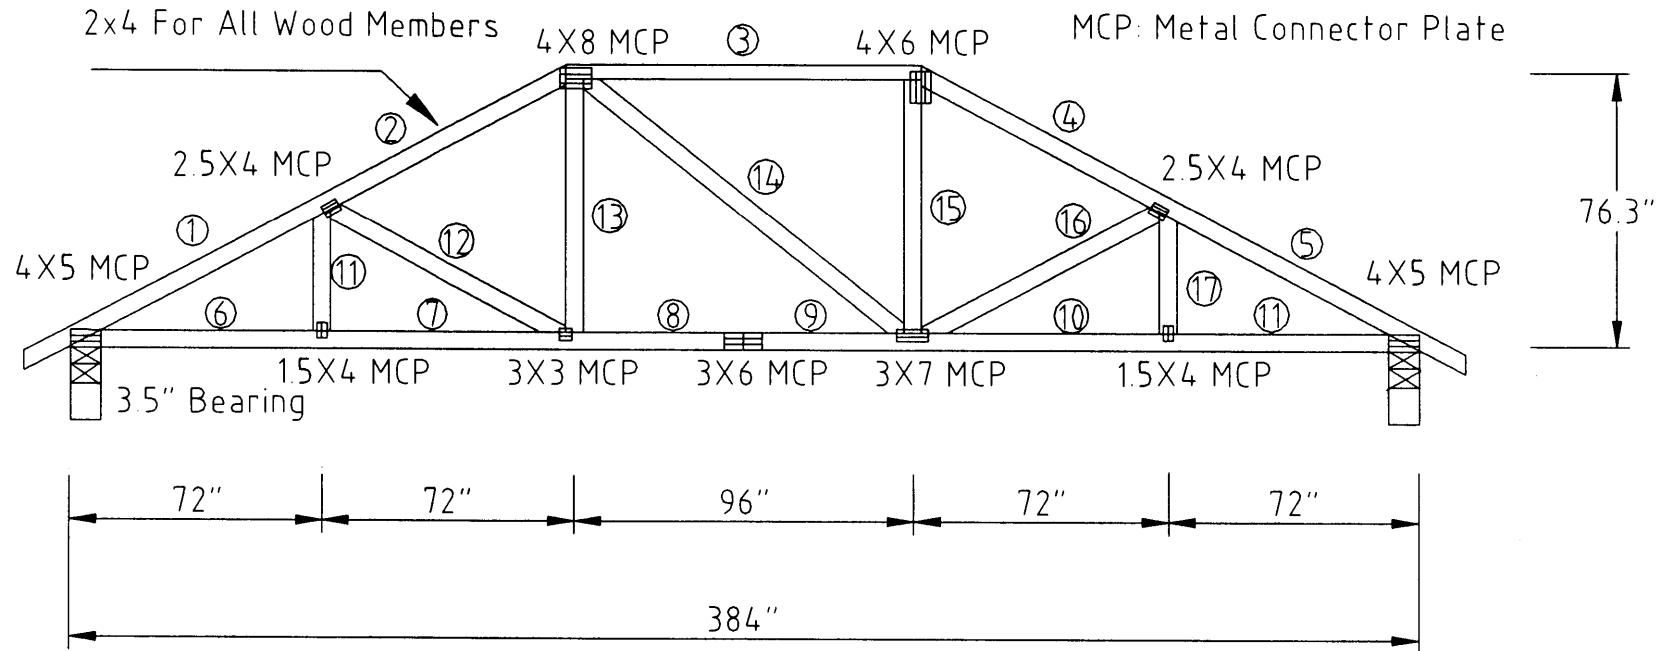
MPC Truss Type AS2 from a Truss Plate Manufacturer
